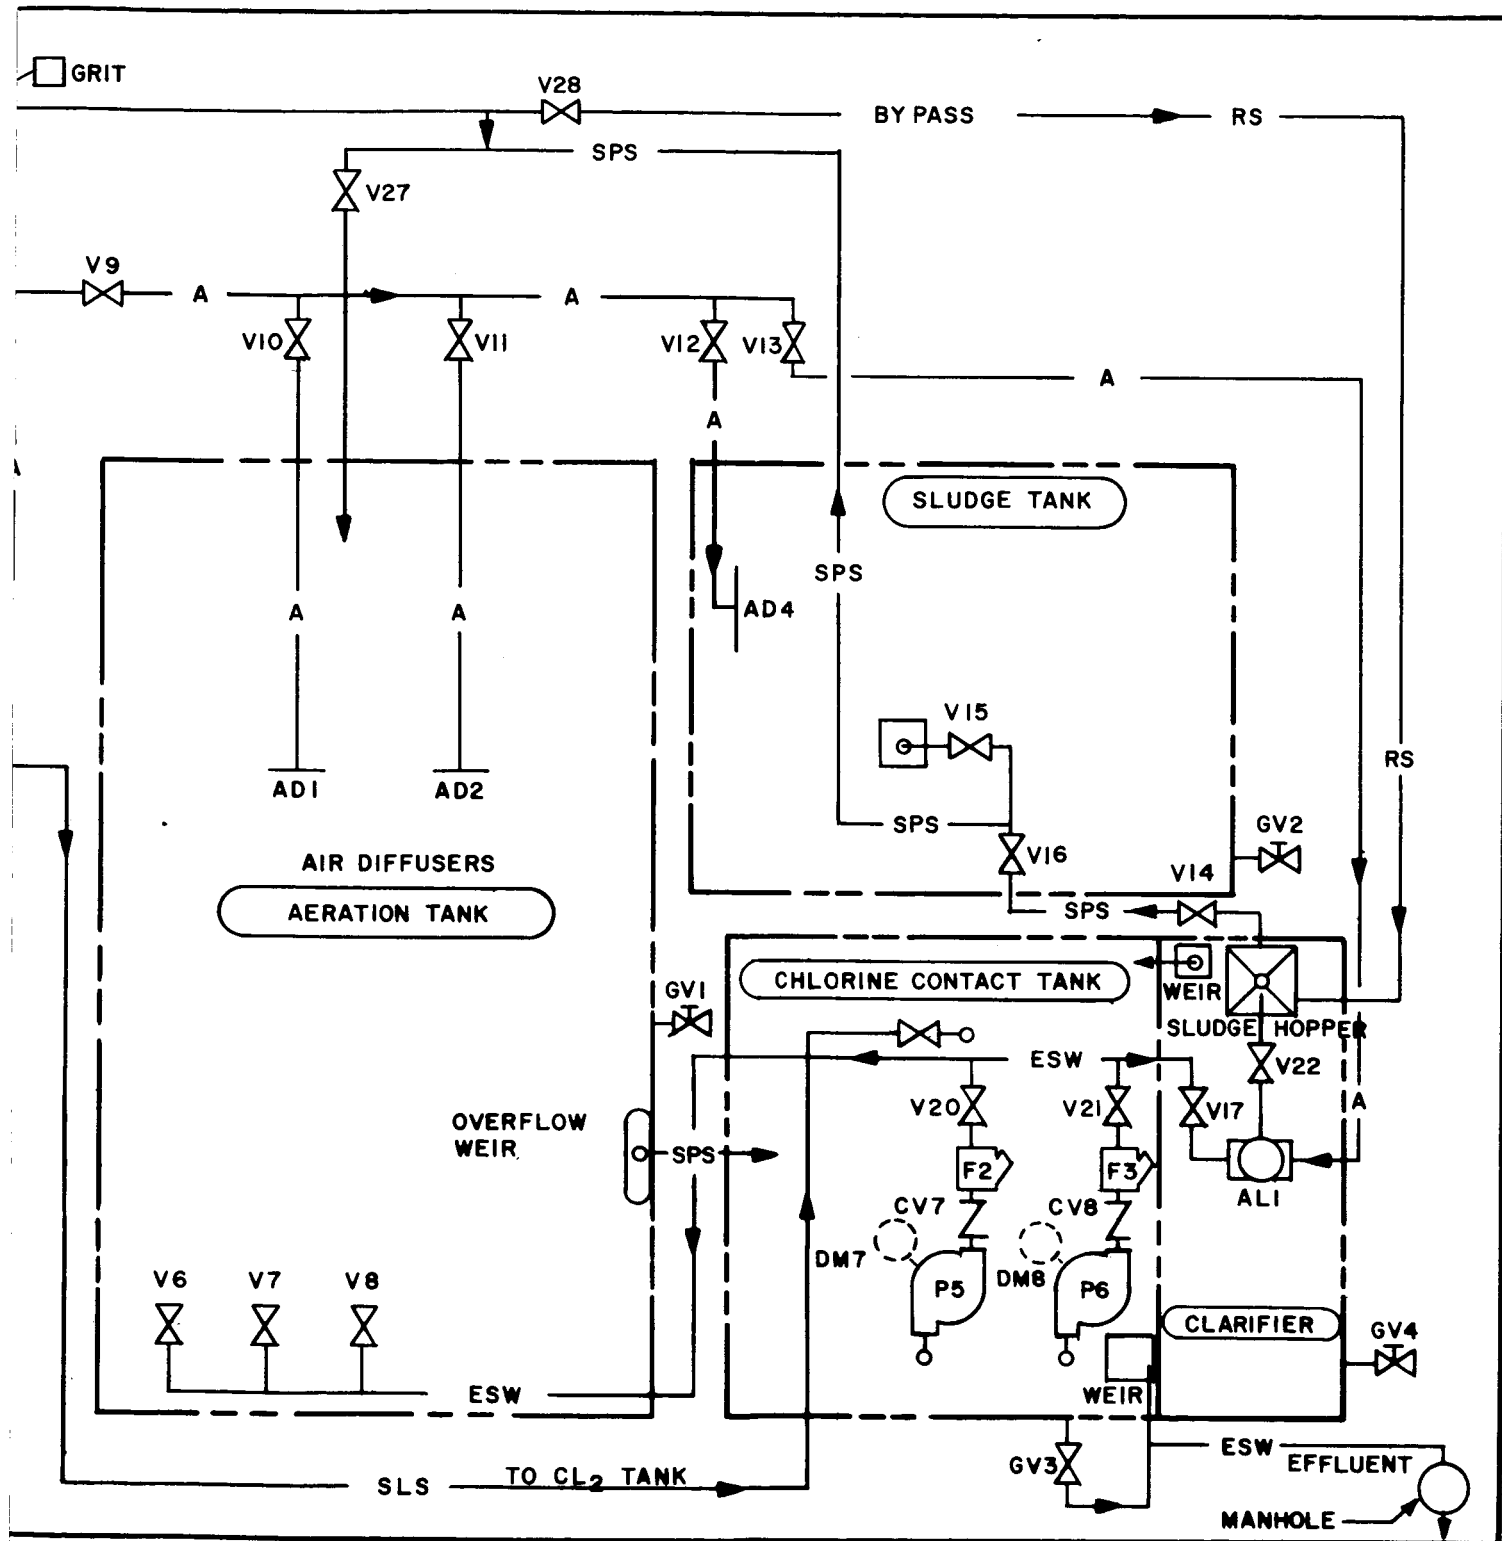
Water Treatment System - Plant No. 5 Building J8-1705
